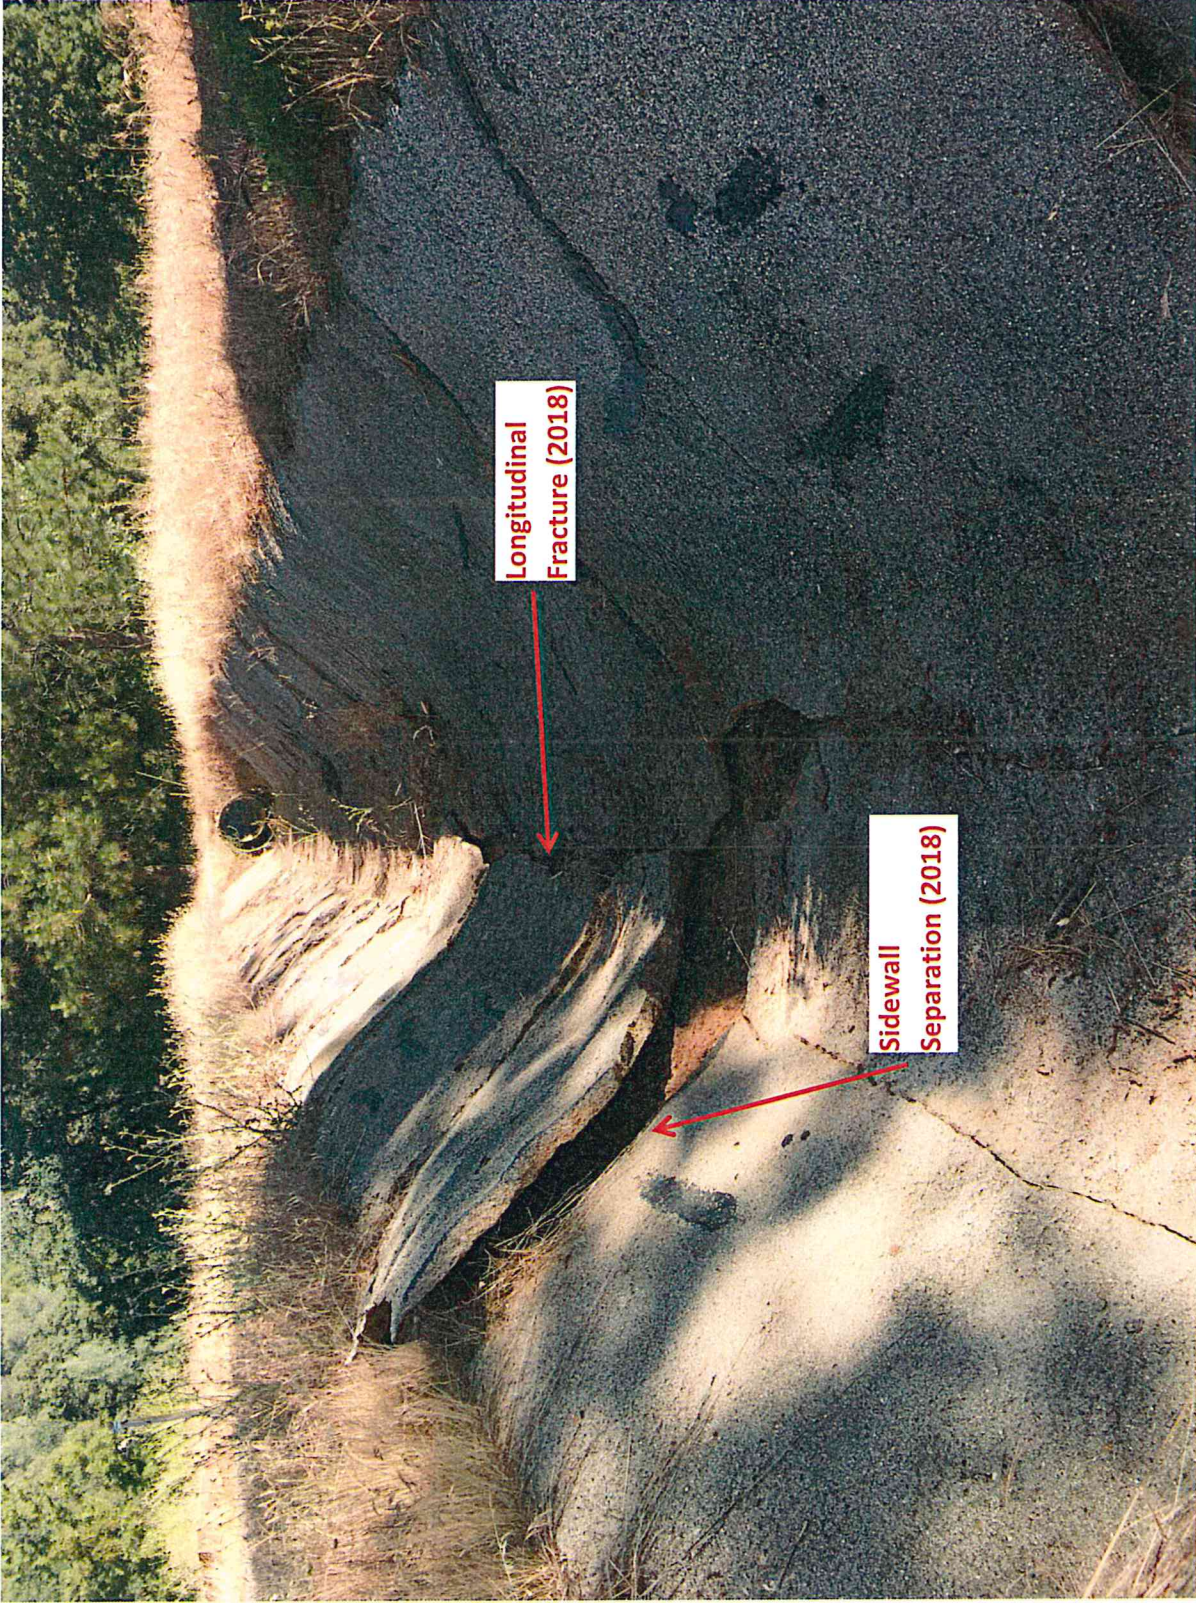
Lower Flume, Upper Section Sidewall Failure, 2018
